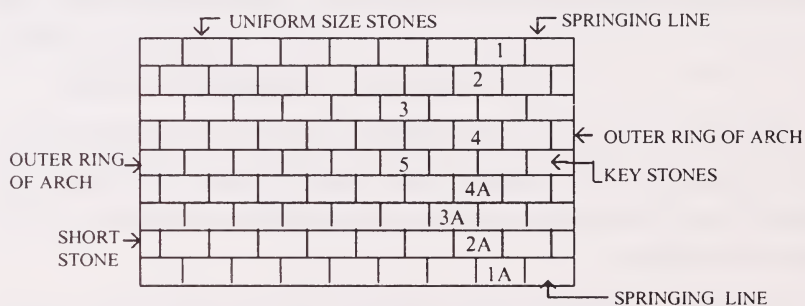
Schematic Plan showing arrangement of Stones/Block in Arch Construction
